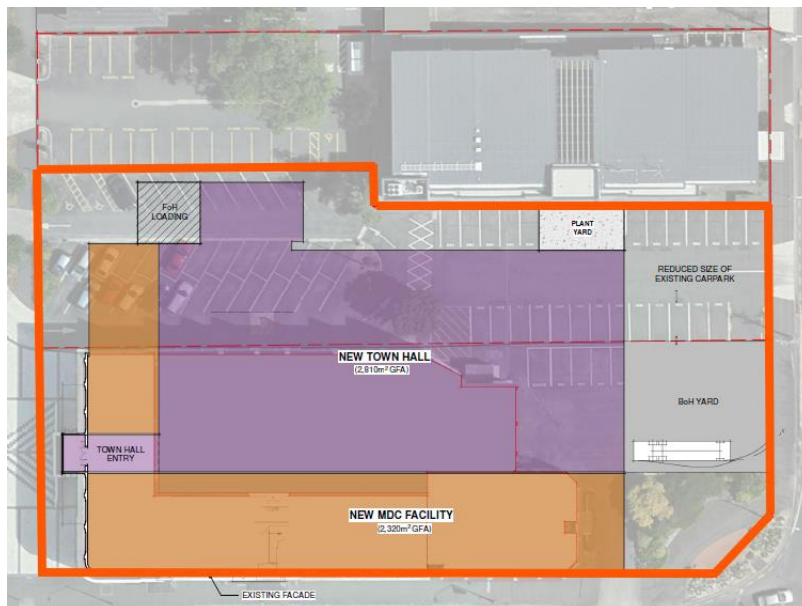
Bulk & Massing Study - Town Hall Alternative Option 1; Site Plan outlined without Waiata House site.
